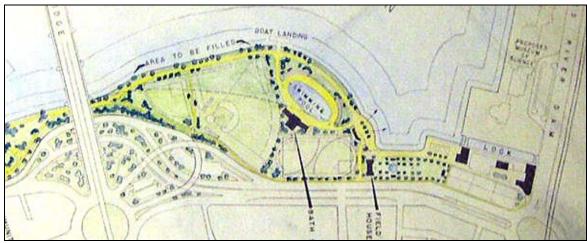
Detail of 1949 plan by Arthur Shurcliff shows land that was taken for construction of Storrow Drive ramps and additional parkland created in the early 1950s. The pool area was not built as shown here. (DCR archives).
